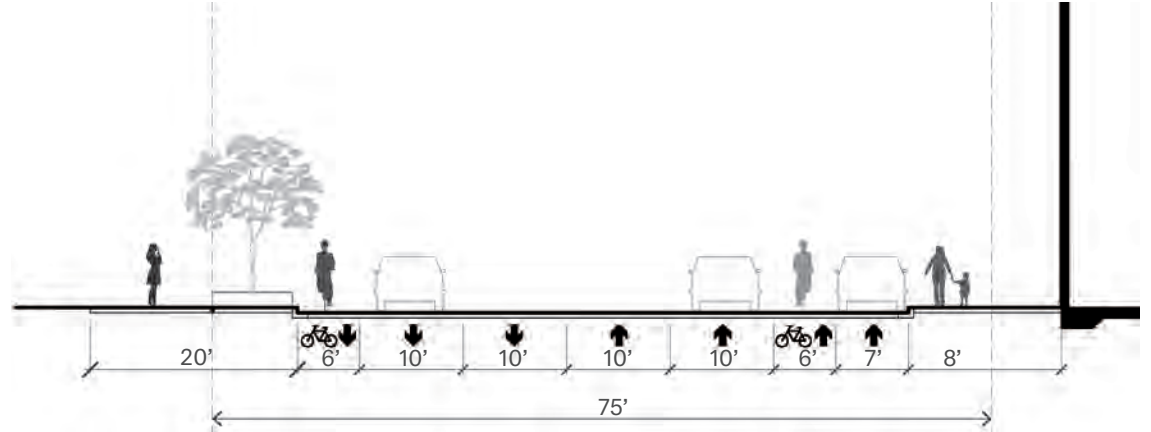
Section E-E' of existing conditions on Barton Springs Road
